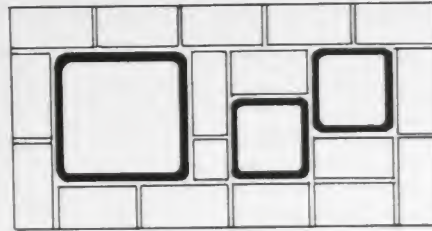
CHIMNEY BUILT WITH TWO FLUES NOT DIVIDED BY "WITHE" BUT THIRD FLUE SEPARATED BY FOUR INCHES BRICK DIVISION WALL.
